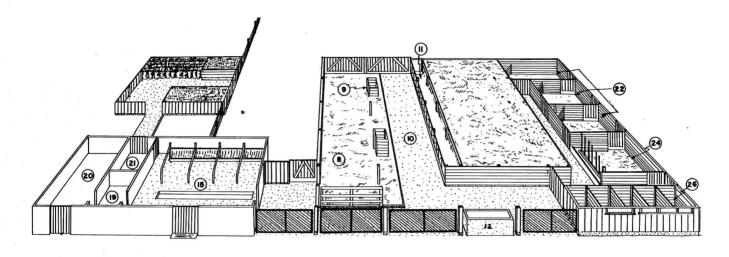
Working arrangements for buildings shown in Figure 4. 8—Bedded or resting area; 9—bedding chutes from loft storage above; 10—hay feeding area; 11—hay feeding manger filled from mow direct; 12—watering tank (small drinking place may be used); 15—floor-level milking stalls; 19—vestibule between milking and milk room; 20—milk room; 21—feed room; 22—maternity pens; 24—community calf pens; 26—baby calf pens.
